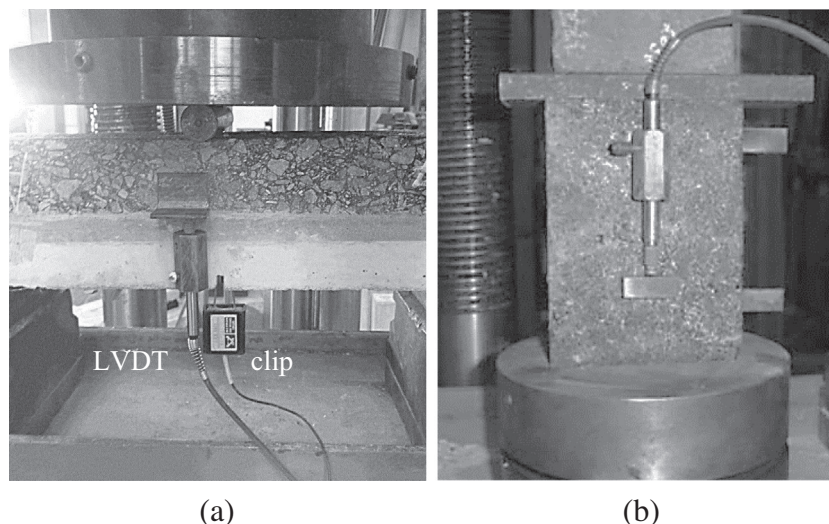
(a) Substrate–overlay beams bending test. (b) Asphalt concrete compression test setup.
